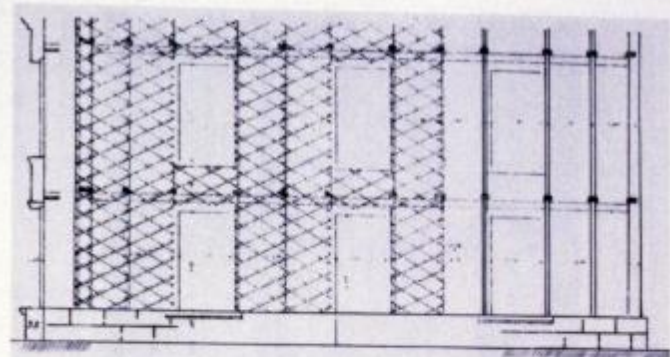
Lacroix system of framing with iron and cement or concrete (*Nouvelle annales de la construction*, X, January, 1864, pl. 7)
